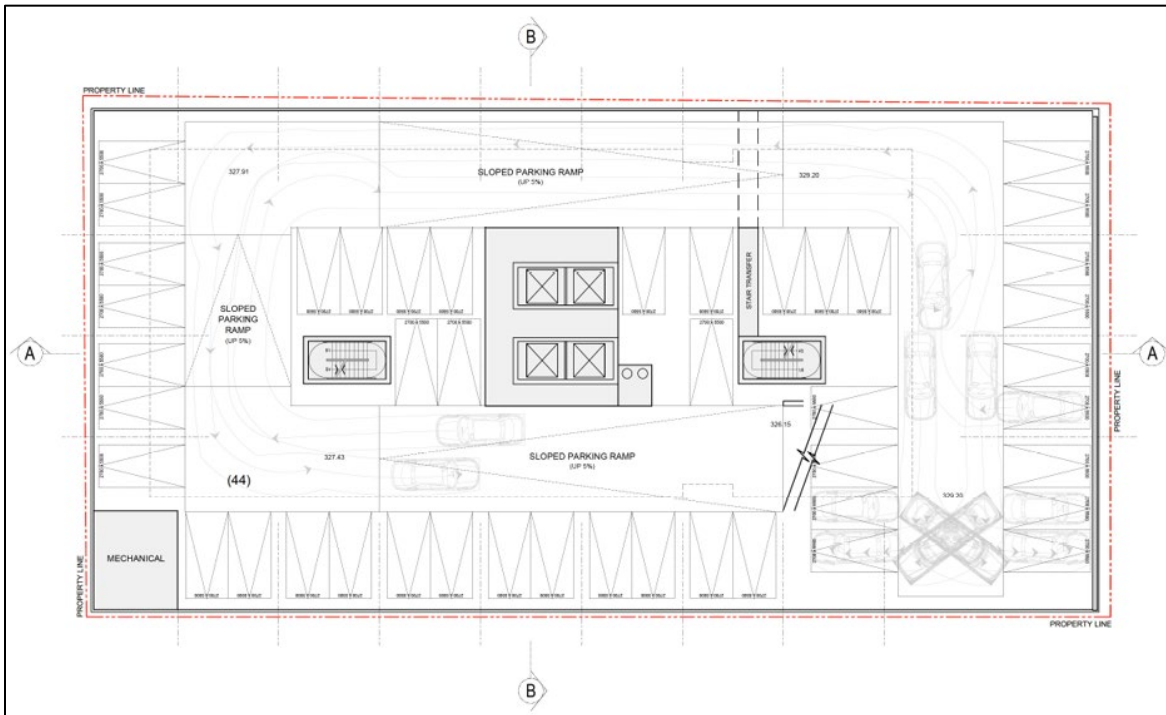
2nd Floor Plan (Source: Hariri Pontarini Architects)
